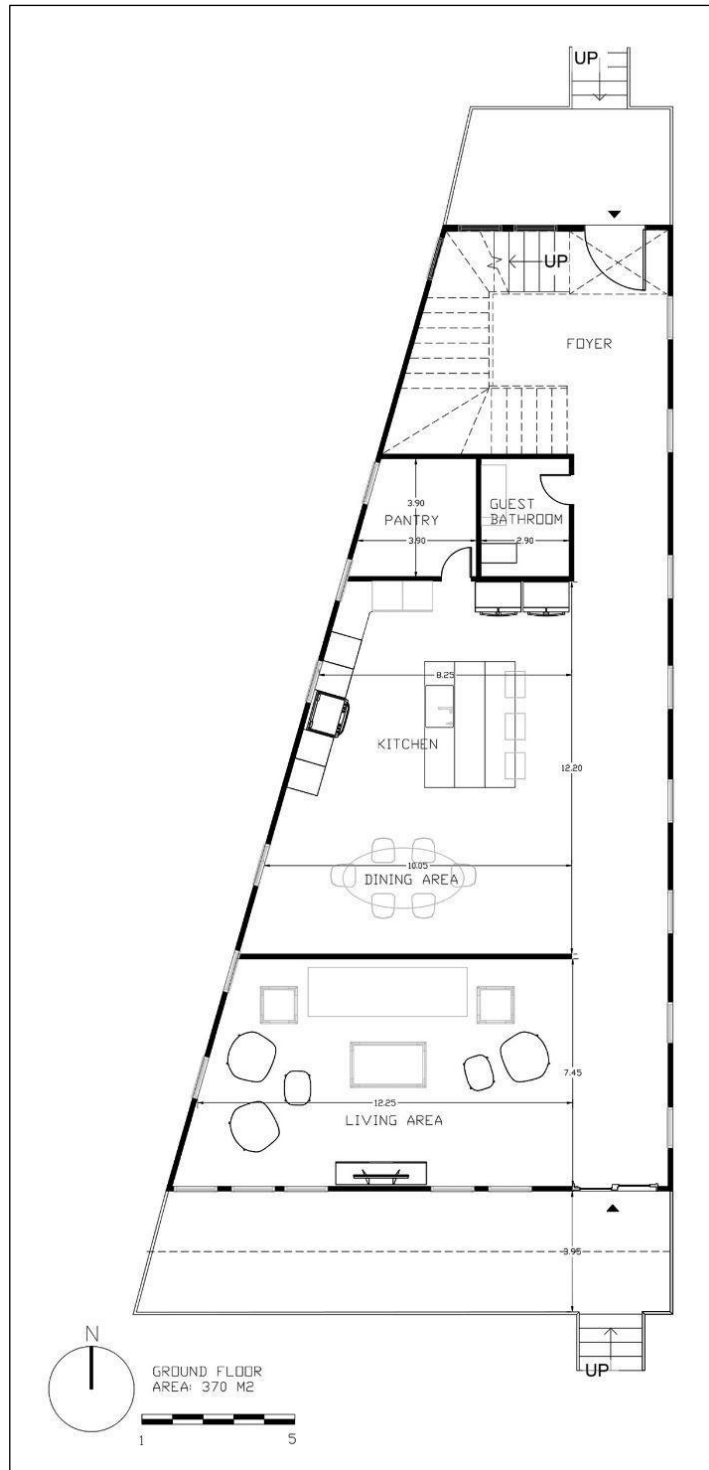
Plan Detail of the Main (Ground) Floor.
